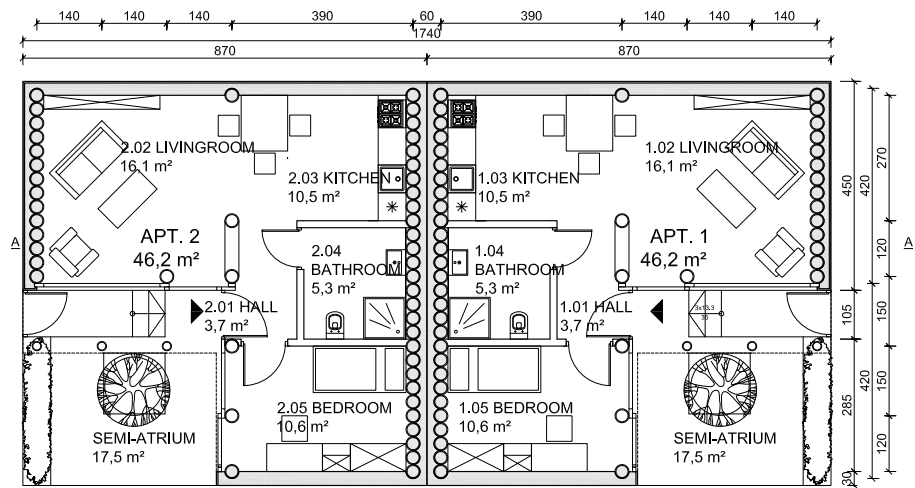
Houses for elderly people: cardboard segment, floor plan, 2012
